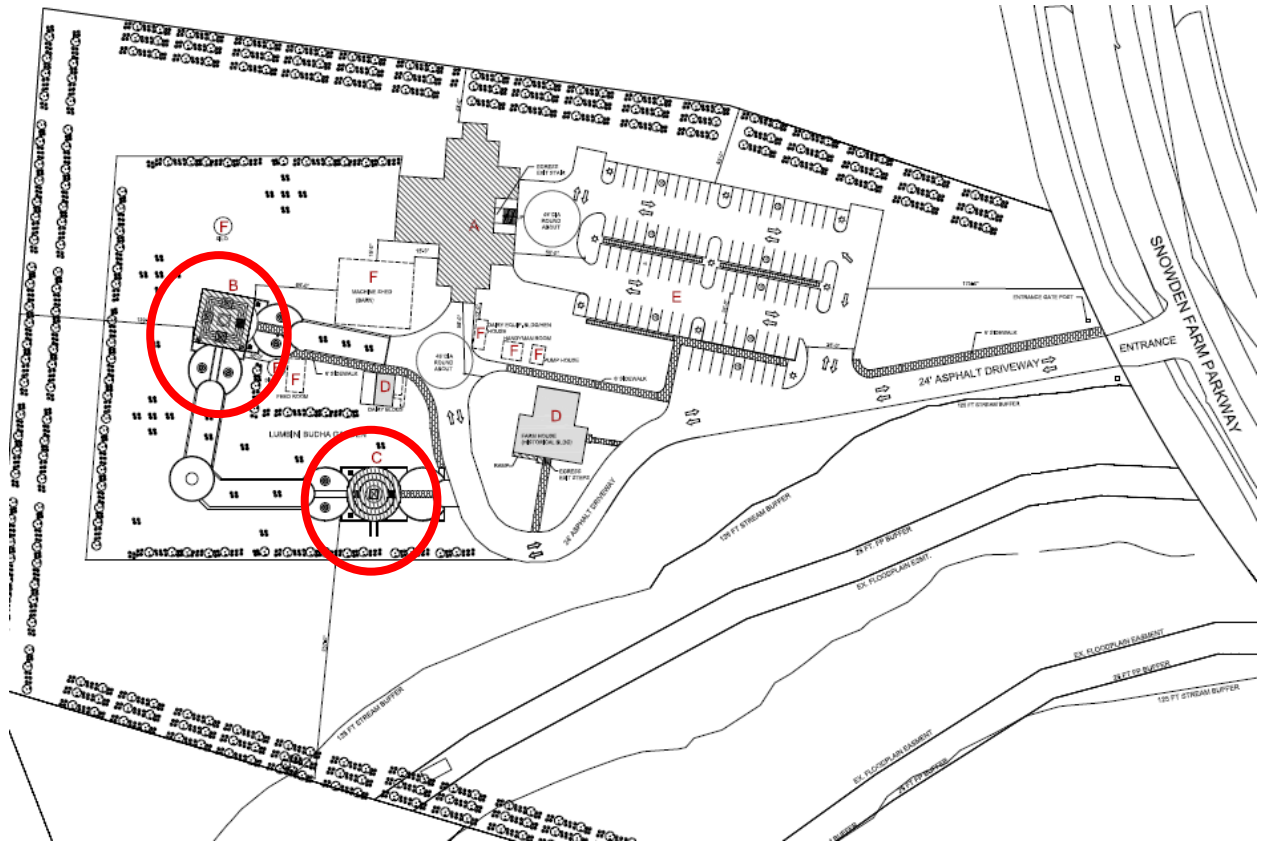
June 2021 concept site plan with statues labeled as 'B' and 'C.'
